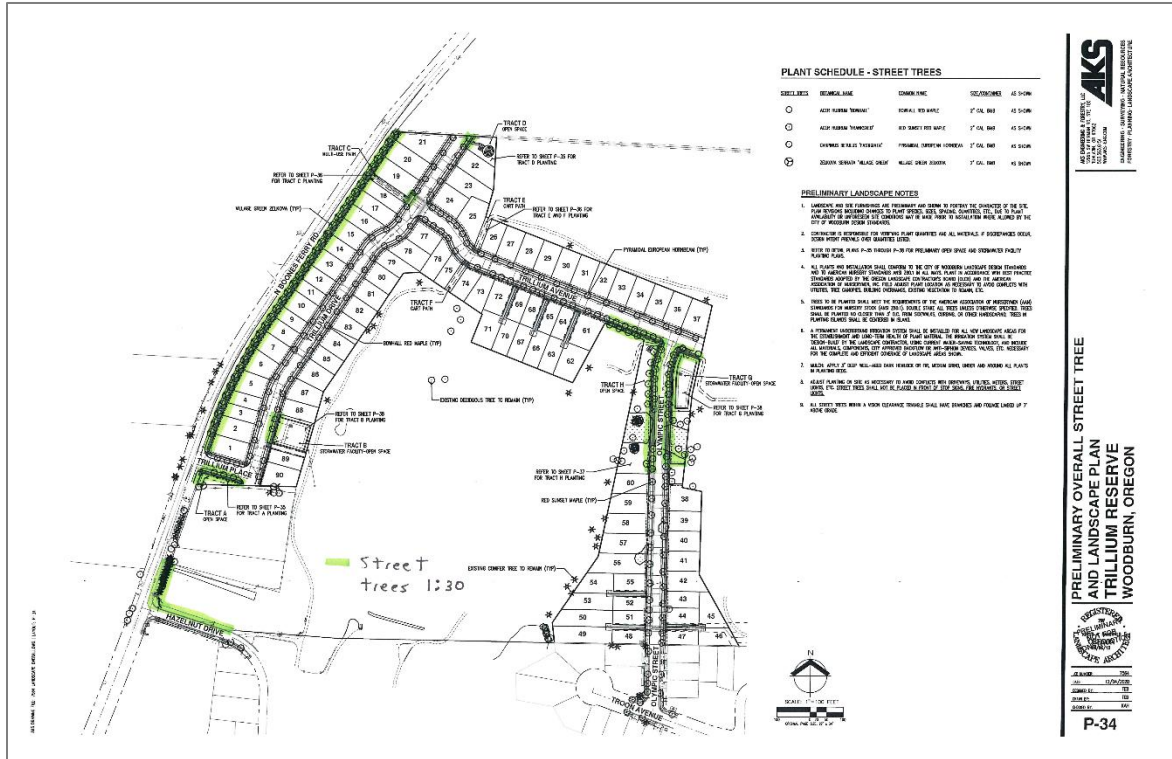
Street Tree Min No. (green: equal to 1 tree per 30 ft of block frontage)
